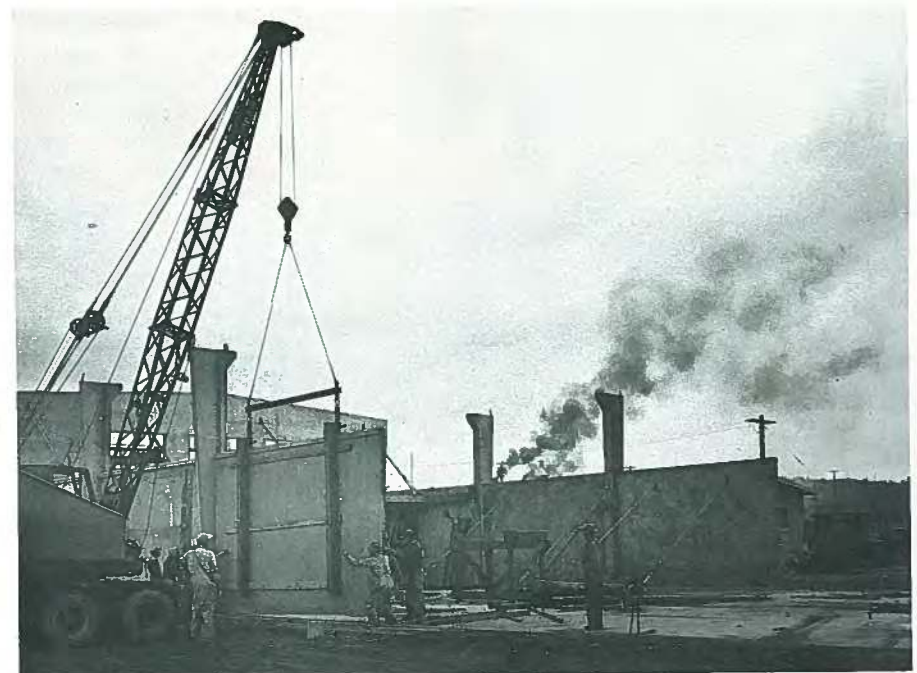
Erection of precast columns and wall panels of Concrete Engineering Company plant.
